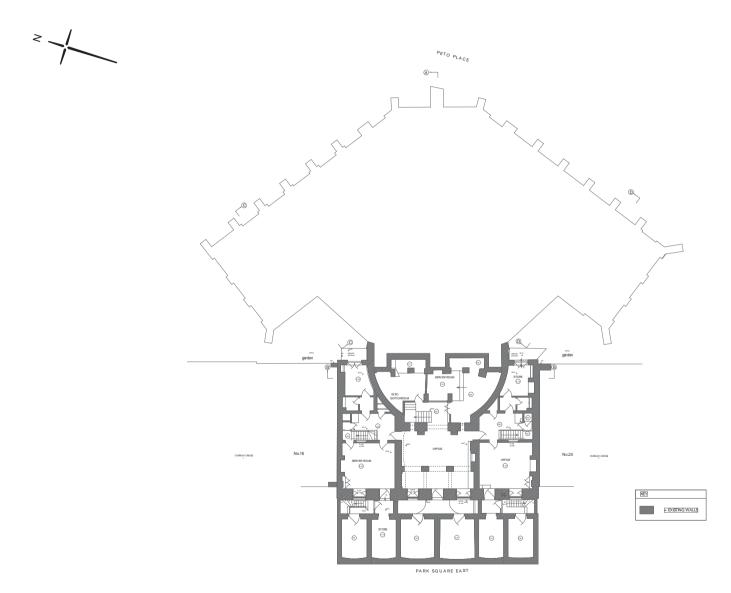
Existing basement plan (Hub Architects and Designers Ltd, Dwg No: 1126-EX-01, June 2012)
